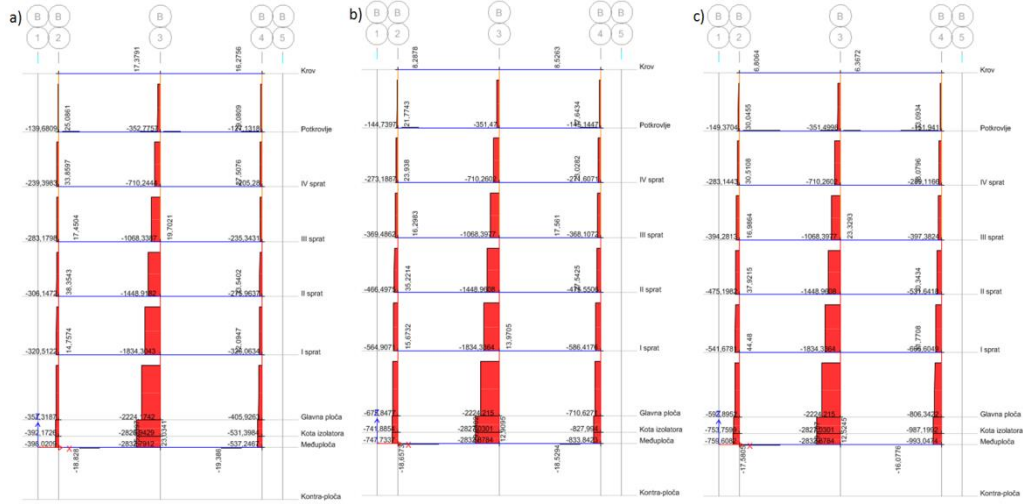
Axial forces in characteristic frame: a) without hinges, b) with hinges only in beams, c) with hinges in beams and columns
